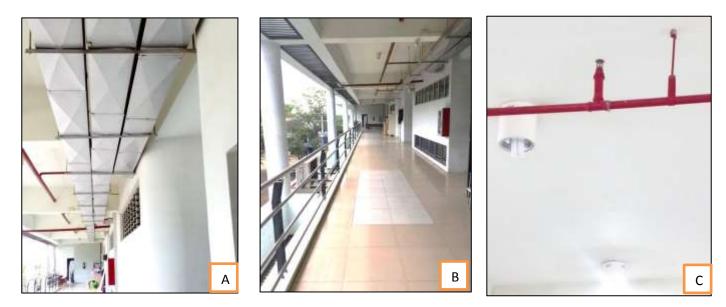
a) Gas exhausts vents outside the laboratories; b) Clutter free hallways; c) Emergency water sprinklers
